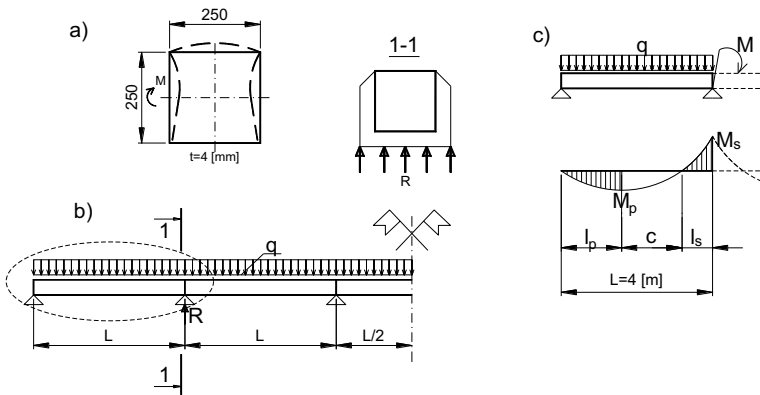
Continuous beam structure and loading: a) box cross-section, b) load distribution, c) computational model acc.to CPM
